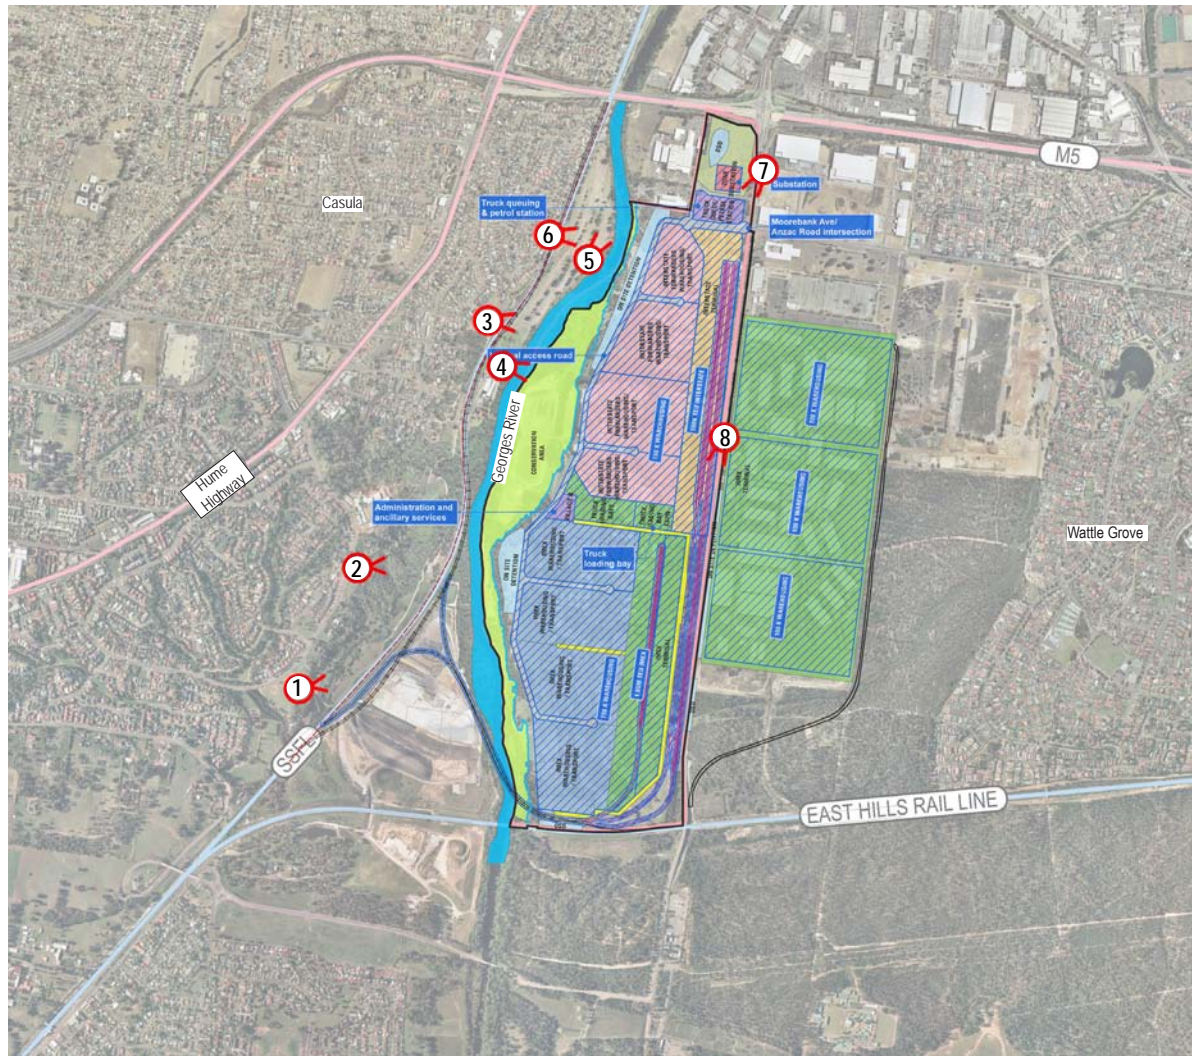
B - Viewpoint locations overlaid on indicative concept layout. Source: Parsons Brinckerhoff
